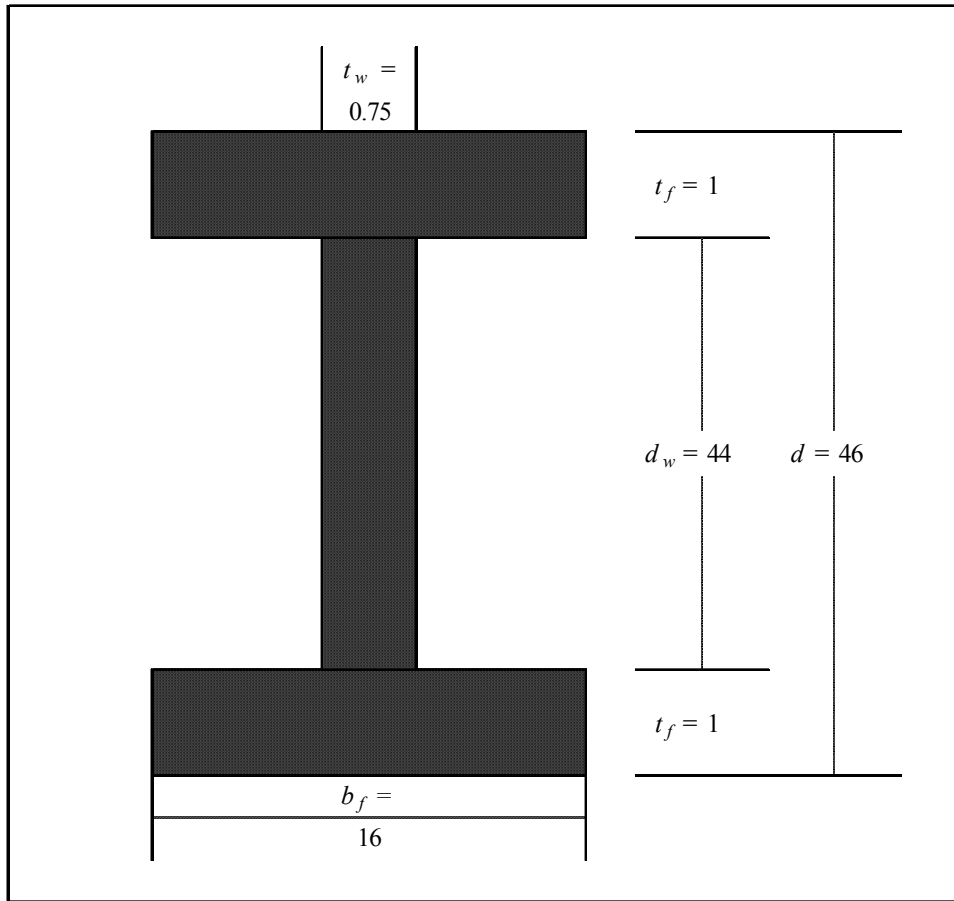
Cross Sectional Dimensions (inch) for Painted Steel Girder Element of Bridge B₁.
